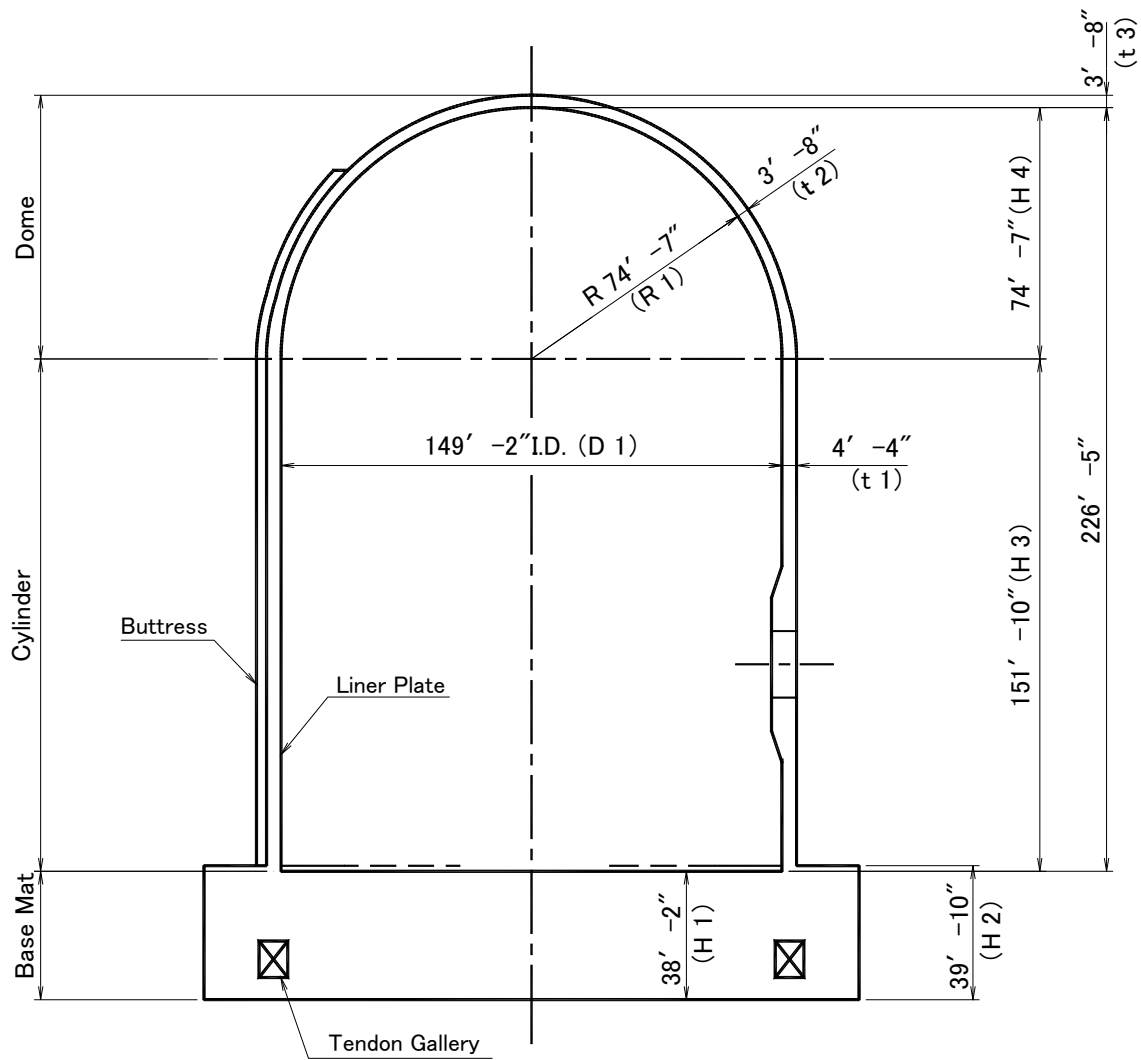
Configuration of Prestressed Concrete Containment Vessel
